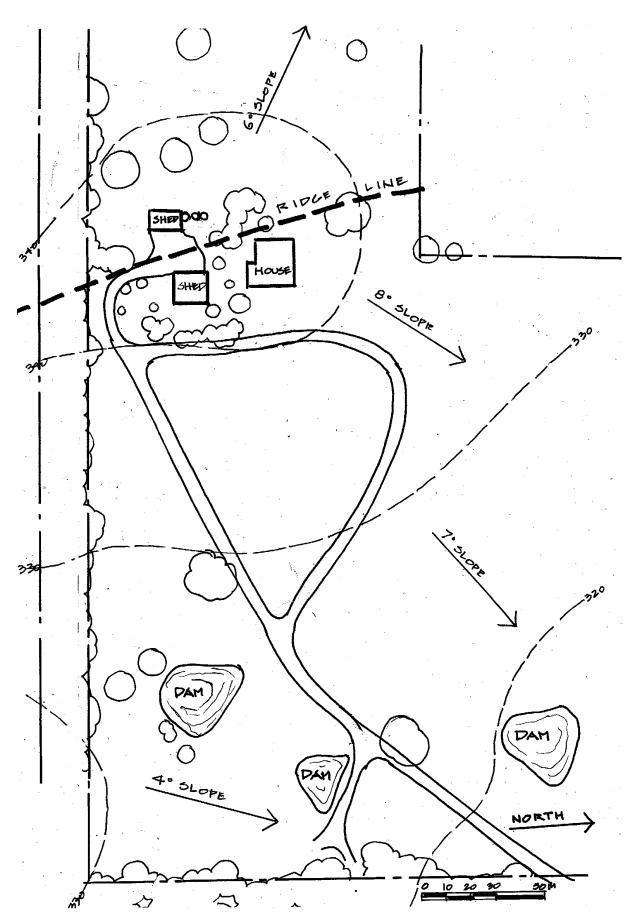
EXISTING CONDITIONS PART PLAN, WESTERN AREA
